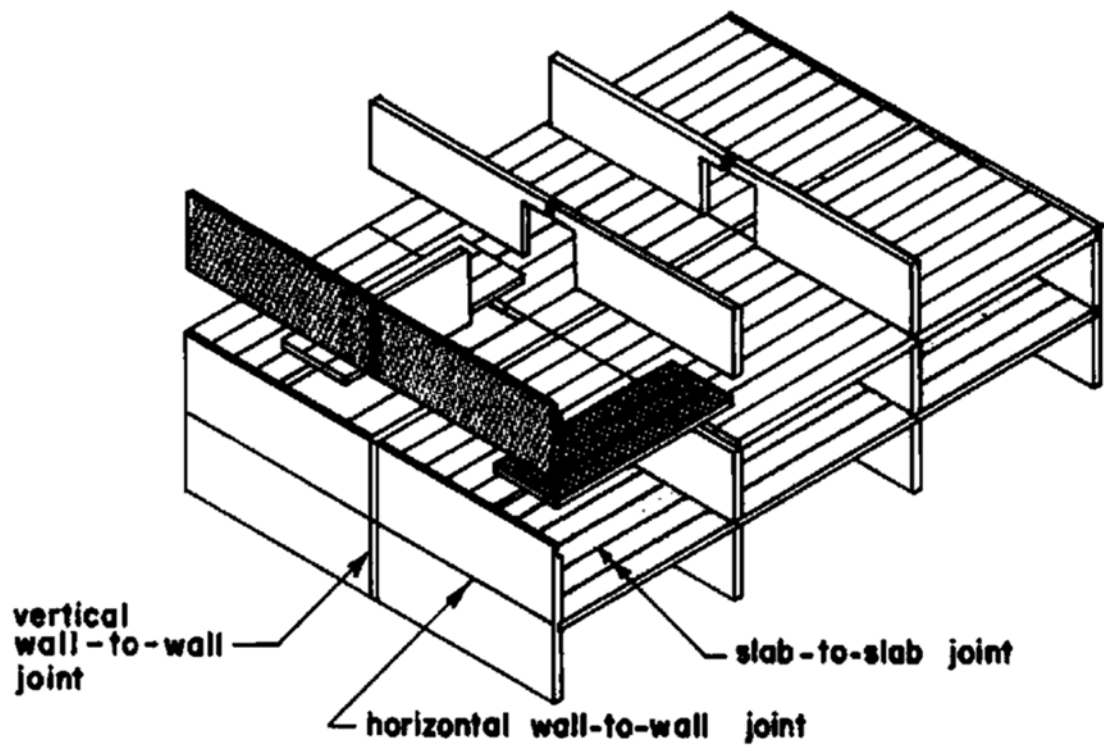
Types of joints in large panel buildings: Vertical and horizontal connections (Pall et al., 1980)
